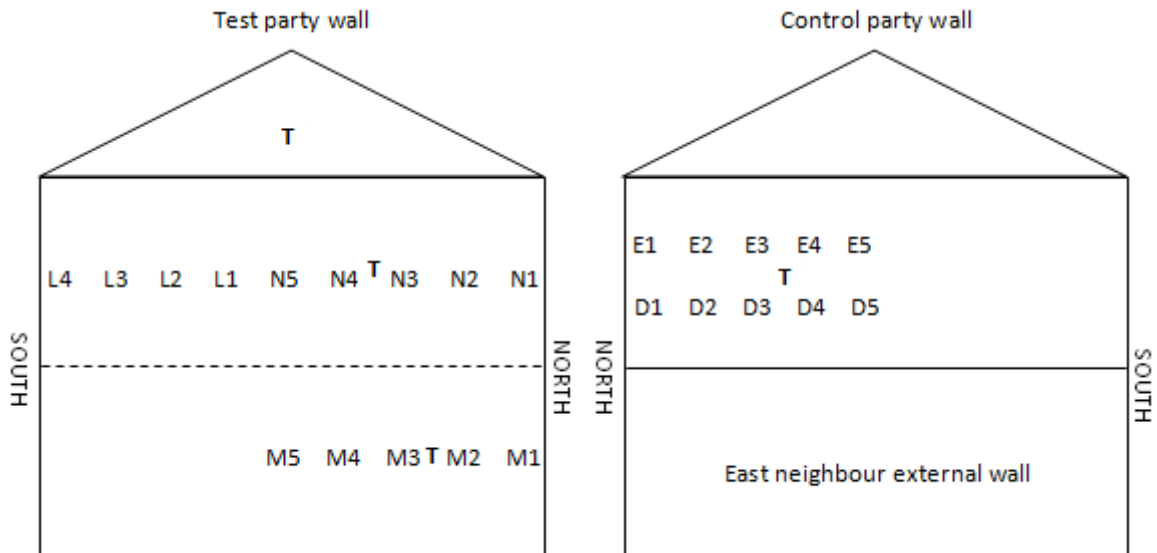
Schematic of HFP locations and identifiers on the party walls of the test house (T denotes location of party wall surface and cavity air temperature measurements)
